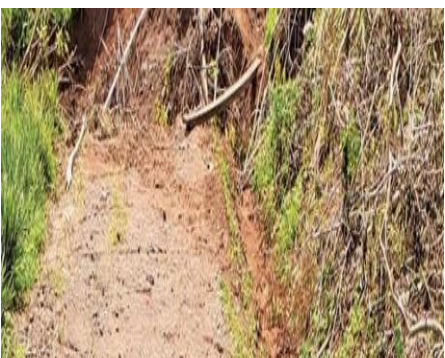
Rabulu road (Tavua) damaged due to continuous flooding on 17th February, 2023. Source: fijivillage.
